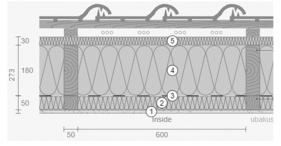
Timber frame panel construction - roof (1 - plasterboard 12.5 mm; 2 - mineral wool 50 mm; 3 - vapor barrier 0.5 mm; 4 - mineral wool 180 mm; 5 - hard mineral wool 30 mm)
